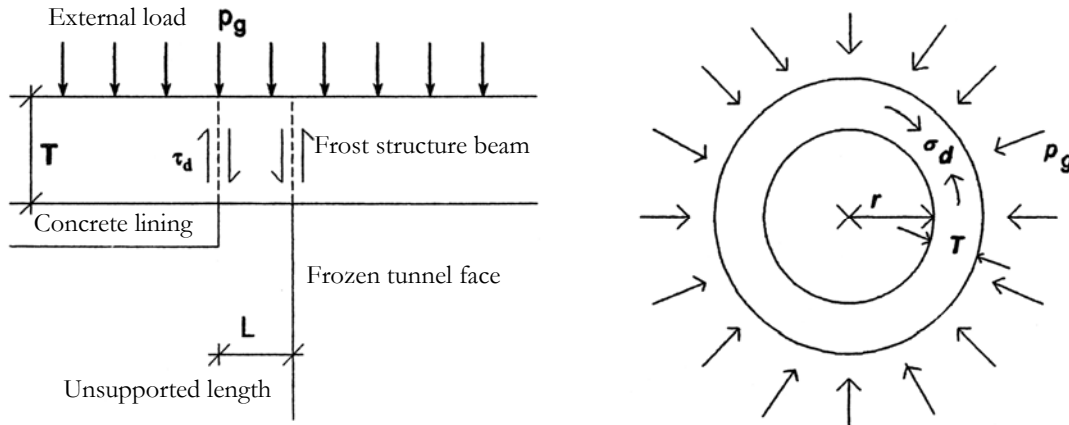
Design of the frozen ground as an aid in tunnelling at Hurum. On the left-hand side, illustration of the necessary thickness of the frozen structure, bearing between the frozen tunnel face and the concrete lining. On the right-hand side, Stress relations at a circular shaped opening according to plasticity theory, modified after Berggren (1999)
